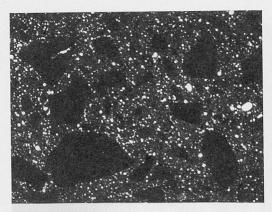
Crack detection on prepared sawn cut. Heavily cracked concrete.
